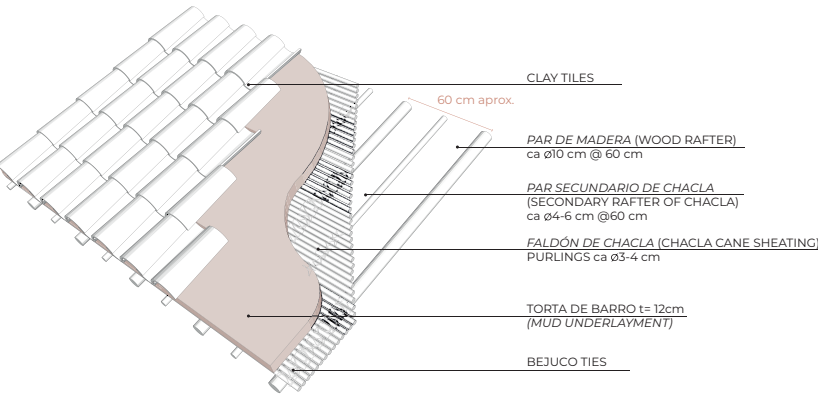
Rooftop 3D detail. “Torta de Barro” support system.
